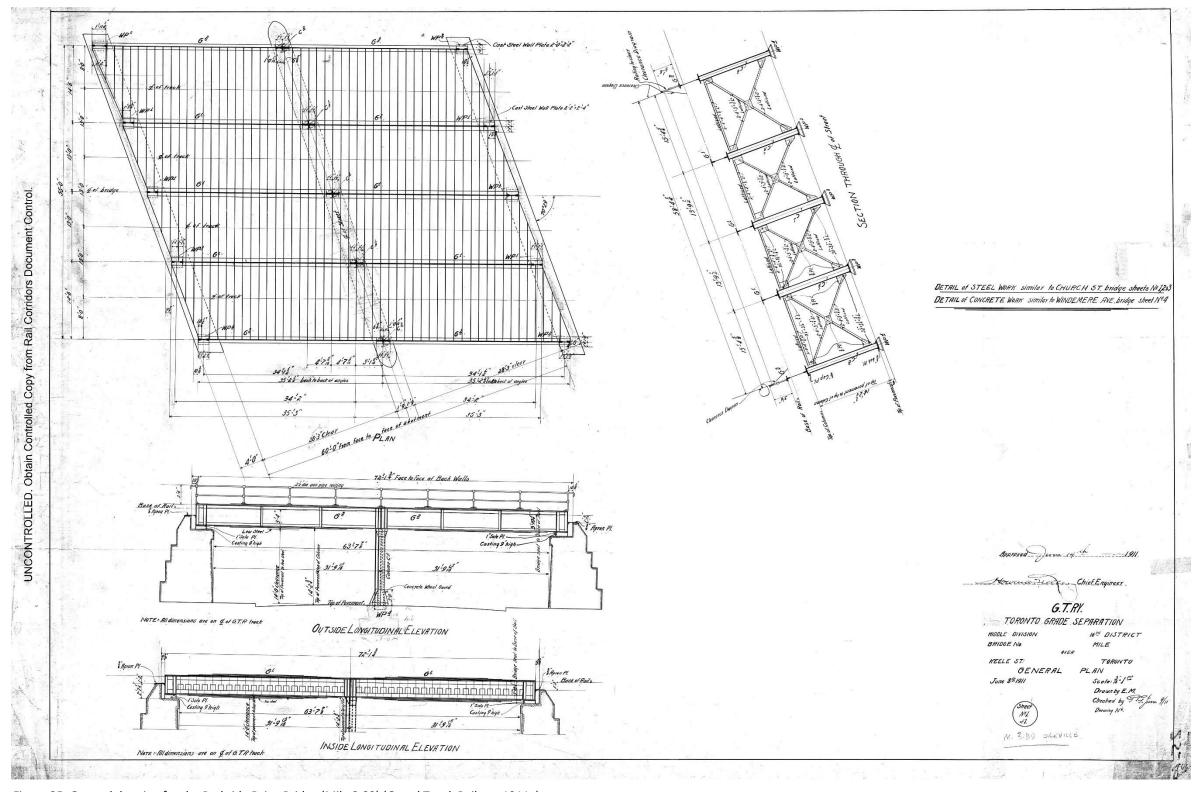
General drawing for the Parkside Drive Bridge (Mile 3.89) (Grand Trunk Railway 1911a).
